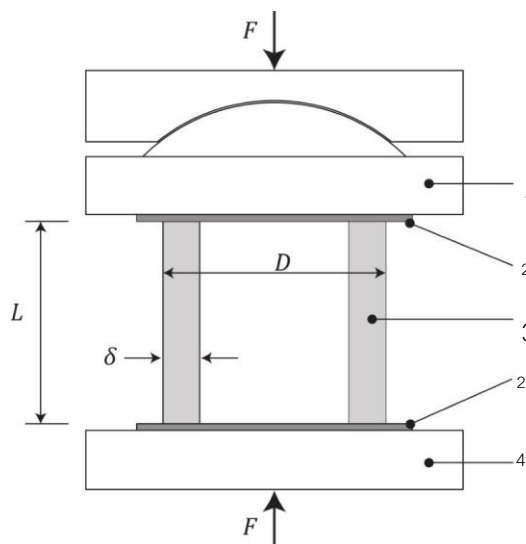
Experimental setup for compressive testing of bamboo specimens. The figure shows the bamboo specimen placed in the UTM for compression testing. The load cell and displacement sensor are also shown in the figure
